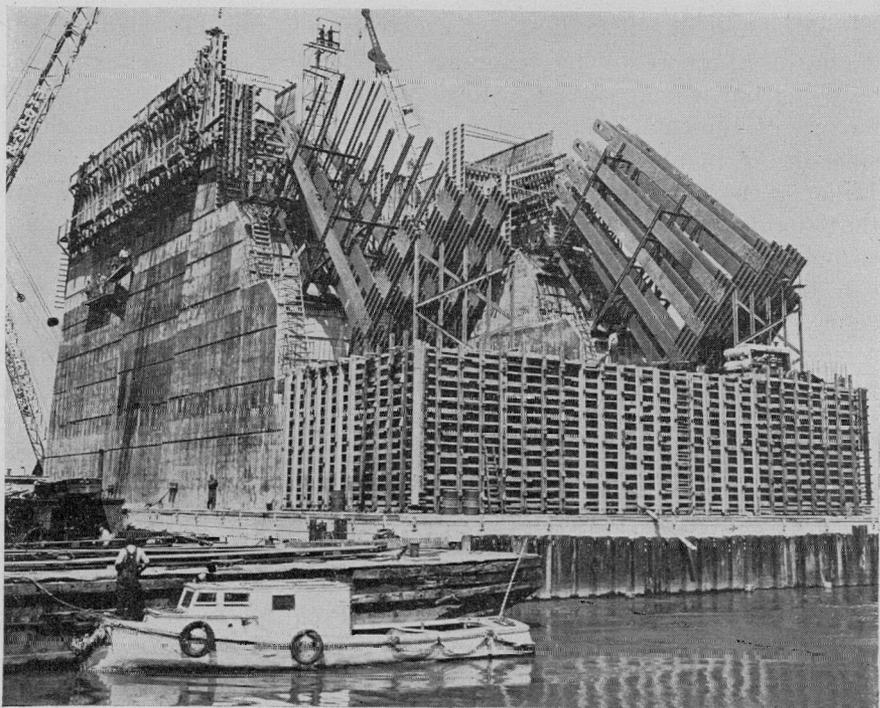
EAST ANCHORAGE PIER DURING CONSTRUCTION, SHOWING ANCHOR BEAMS TO HOLD 20-INCH DIAMETER SUSPENSION CABLES.
